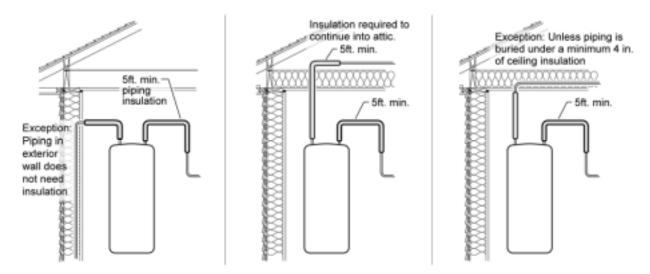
Meeting Pipe Insulation Requirements for Storage Tank Water Heaters
